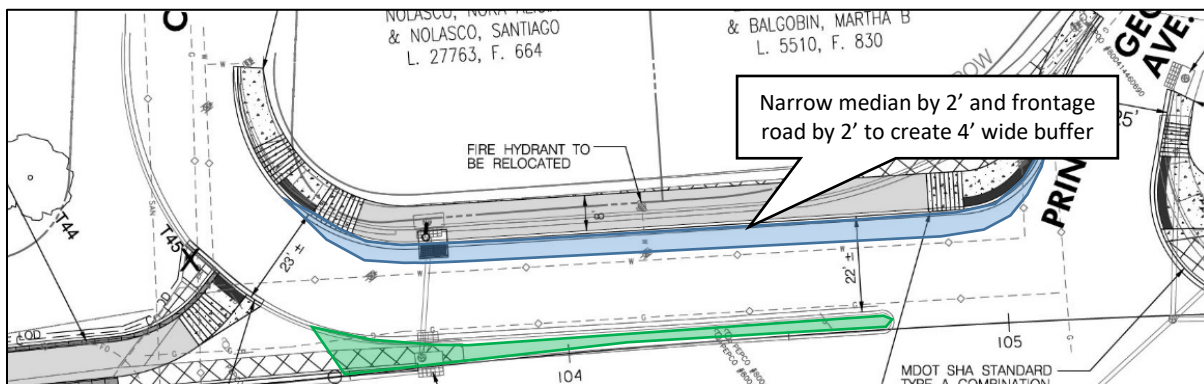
New Ave Bikeway at Conway Avenue to Prince George's Avenue – Proposed Modifications
